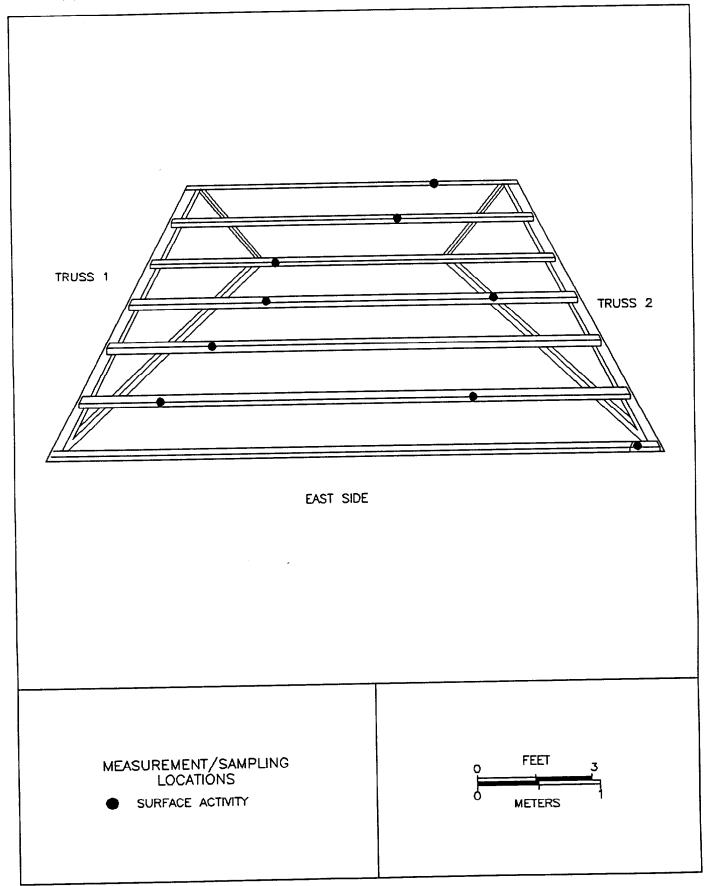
Building 3, Bay 1, East — Measurement and Sampling Locations
